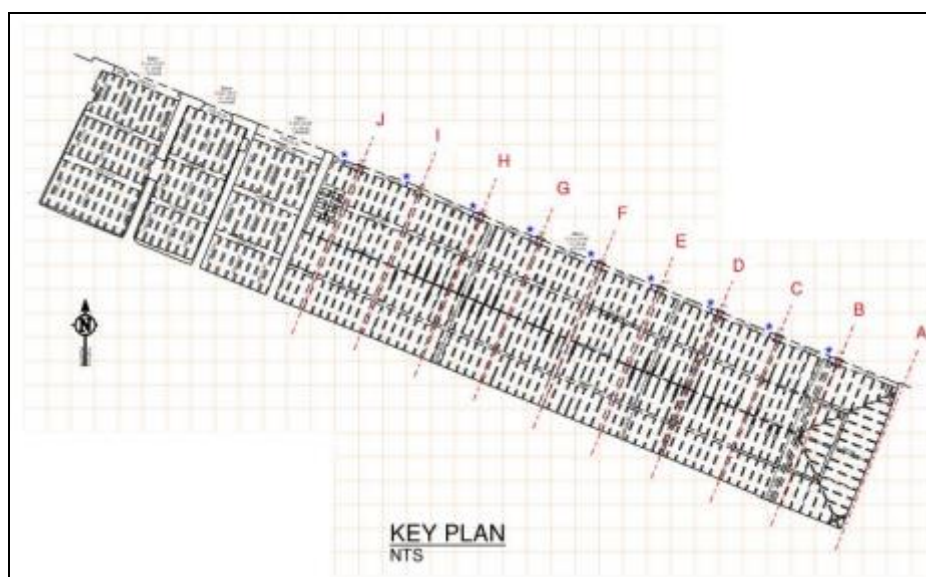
Plan of South Range roof showing roof truss locations and identification (© Conisbee/ Survey Solutions).
